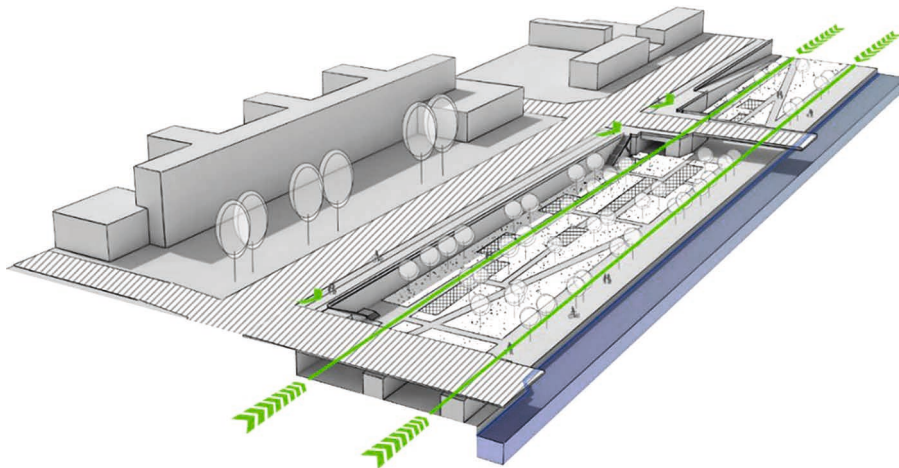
Section of the left bank of the Seine – from Pierre Boieldieu Bridge to Jeanne-d’Arc Bridge (own elaboration)
